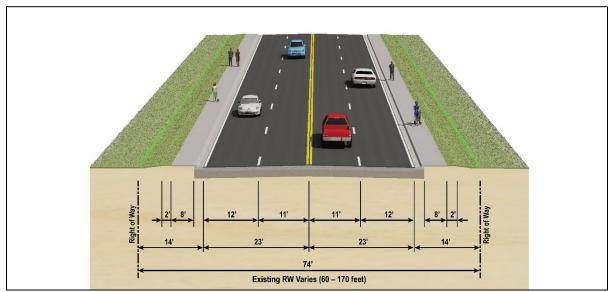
Four-Lane Typical with 8-ft Sidewalks.
